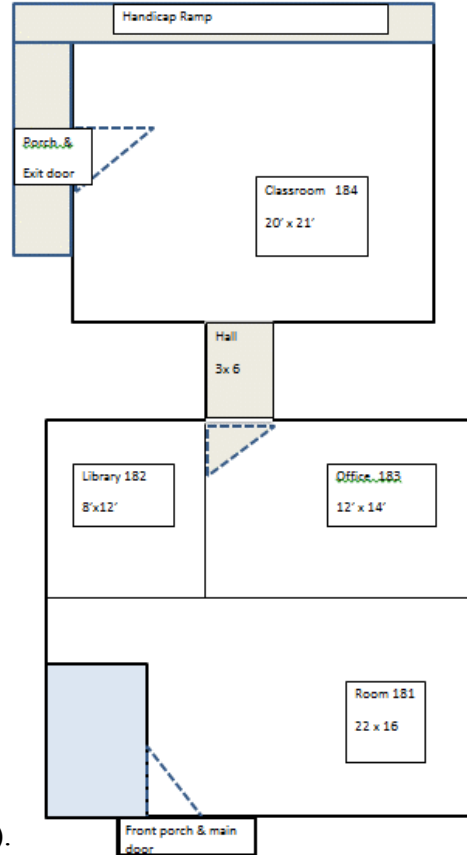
Current Floor Plan of Norfleet House (Monika Fleming).
